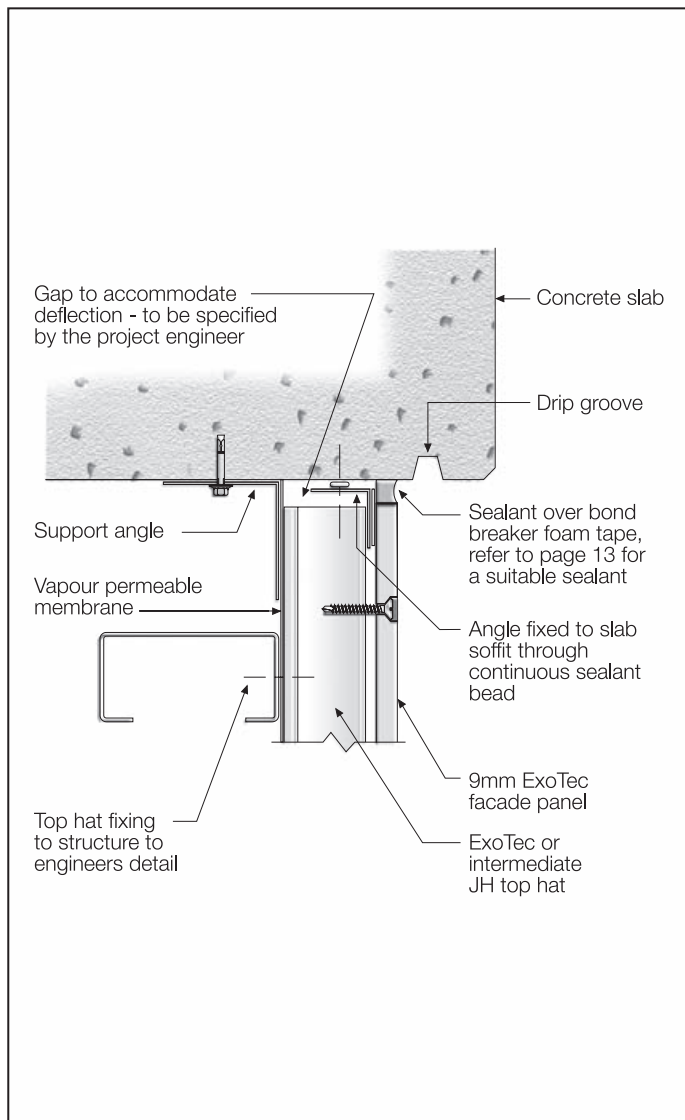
WALL DEFLECTION HEAD USED UNDER SLAB
